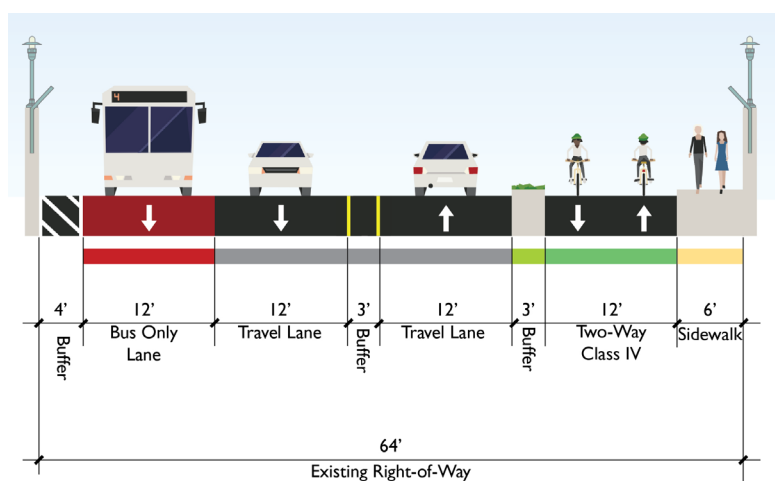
Shellmound Street Bridge (looking west) – SECTION I
